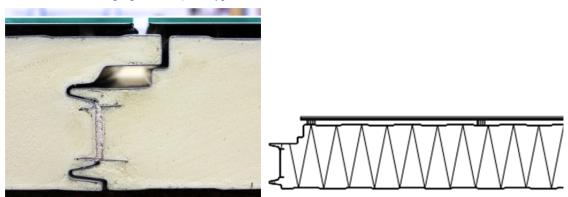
Typical section through glass sandwich panel with polyurethane core (Brucha FP-P sandwich panel).
